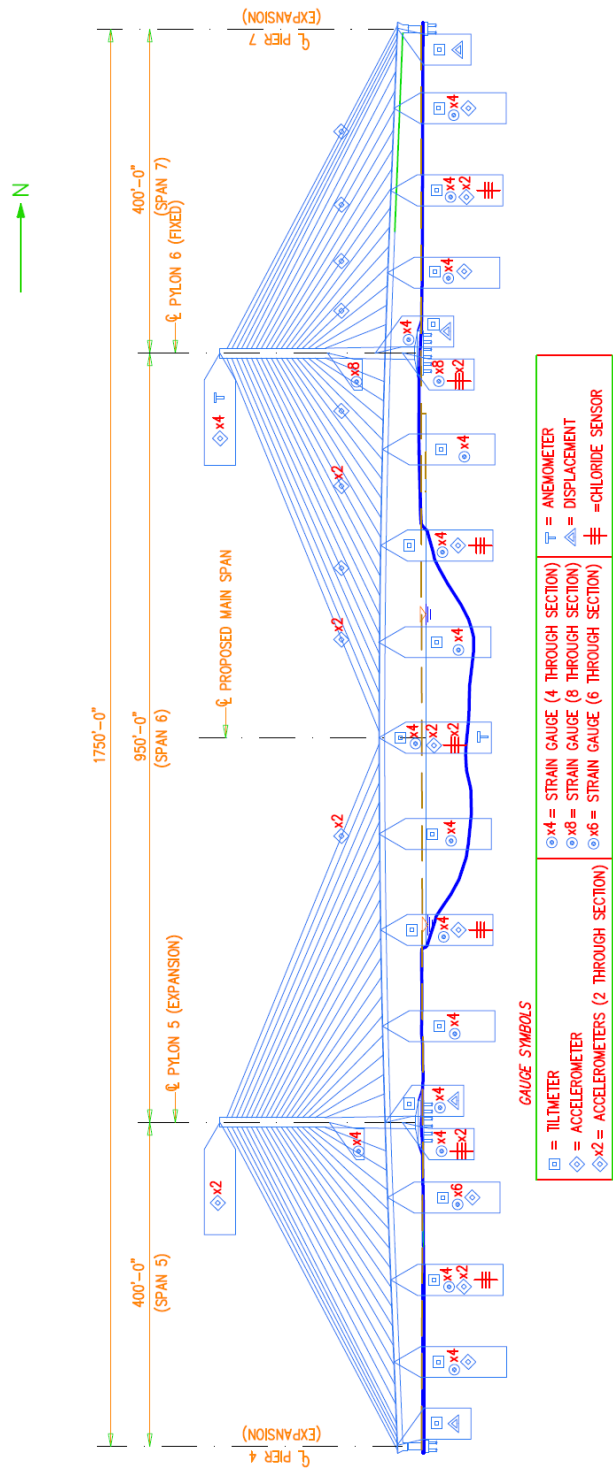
General Elevation View Showing Sensor Layout on the Bridge
